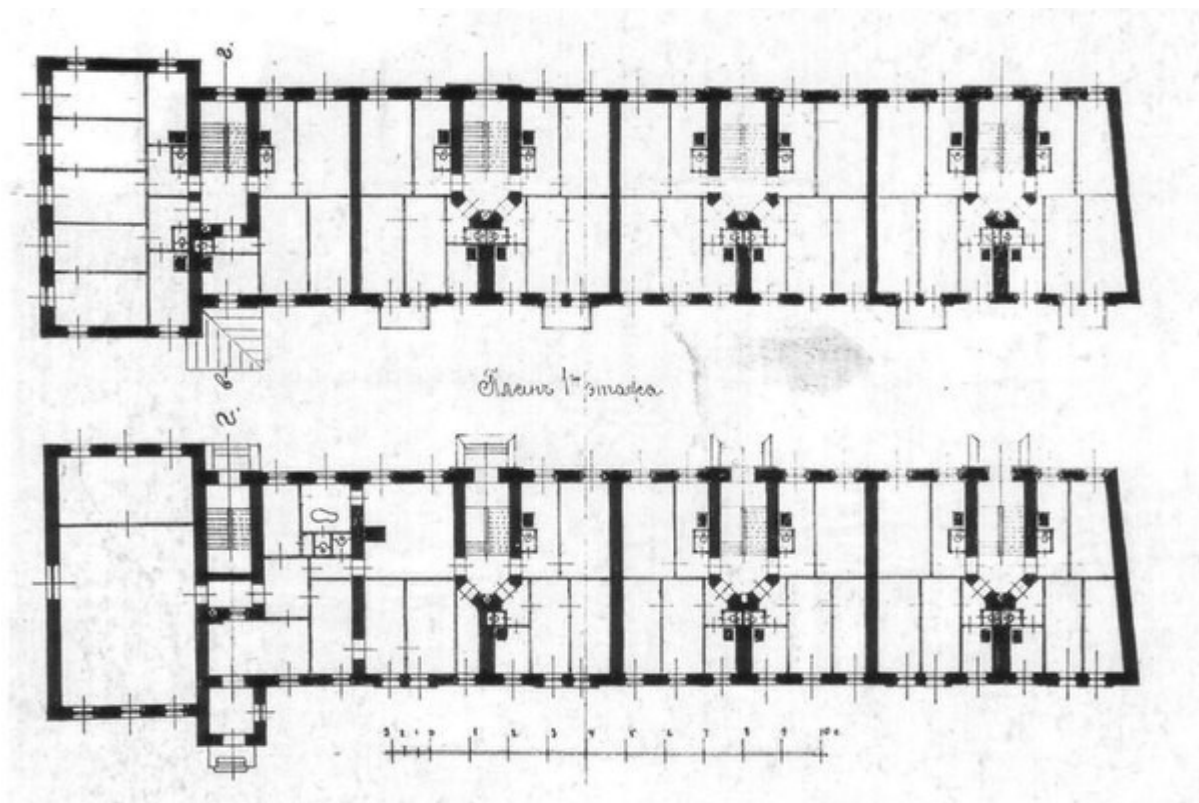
Standard plans of studios or cheap flats with shared facilities on the floor in the new type of tenement houses.
